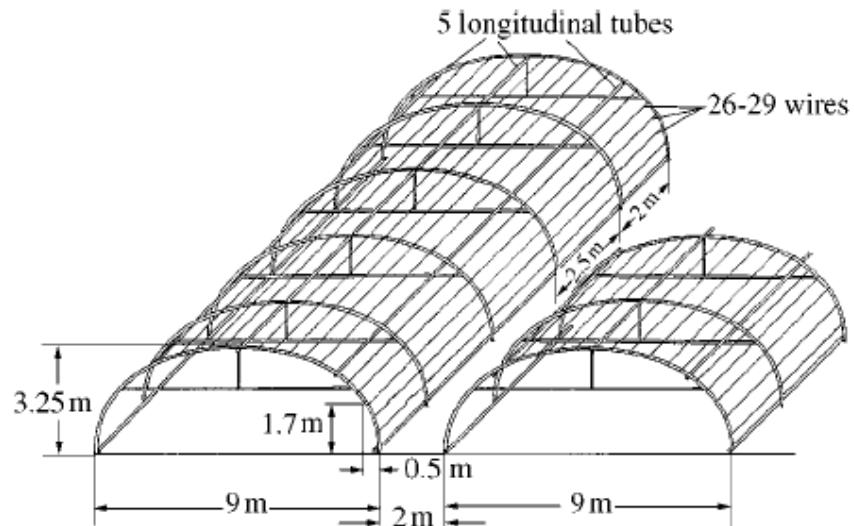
Round-arched tunnel greenhouse with dimensions as an example
